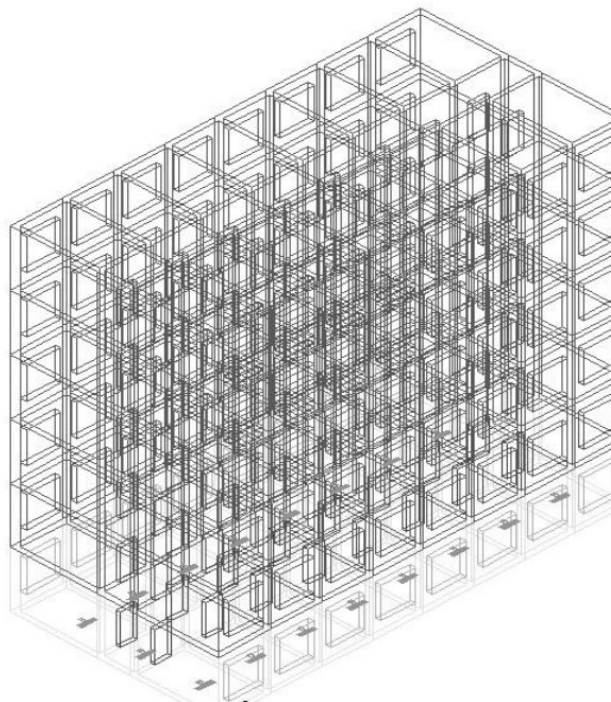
Isometric View of the Dormitory Building Facing Southwest
